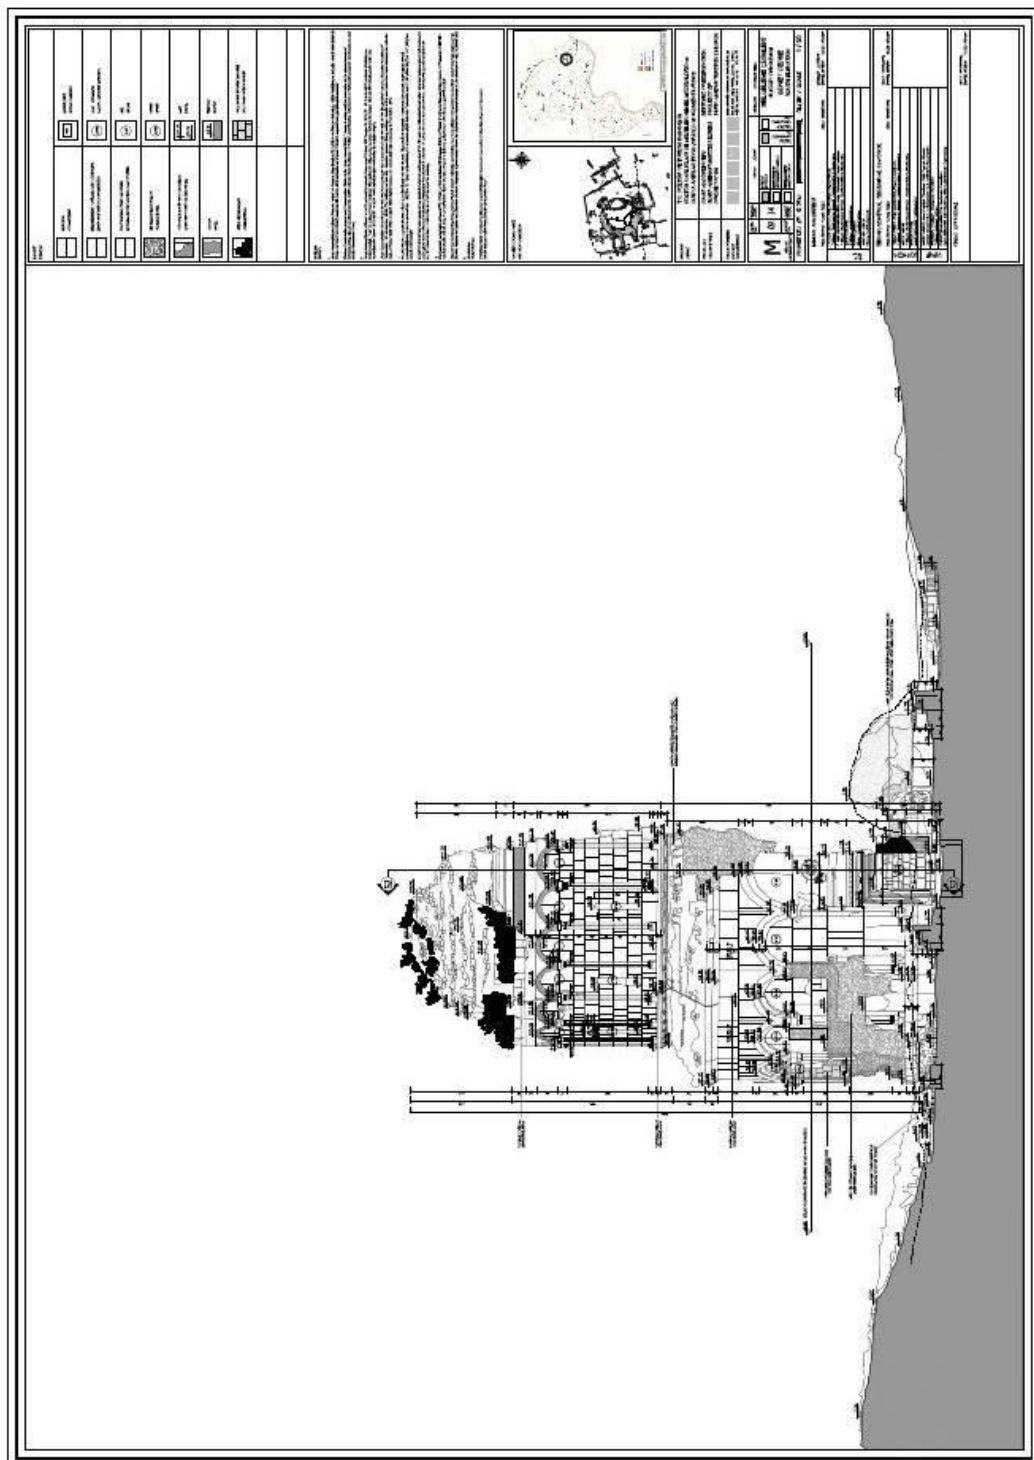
South Elevation, Historic Preservation Project of Surb Amena P'rkich Church, Promet Proje Ltd.Şti. 2012
